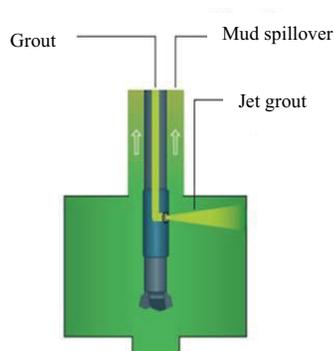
Single pipe method of high-pressure jet grouting pile (S-construction method)
